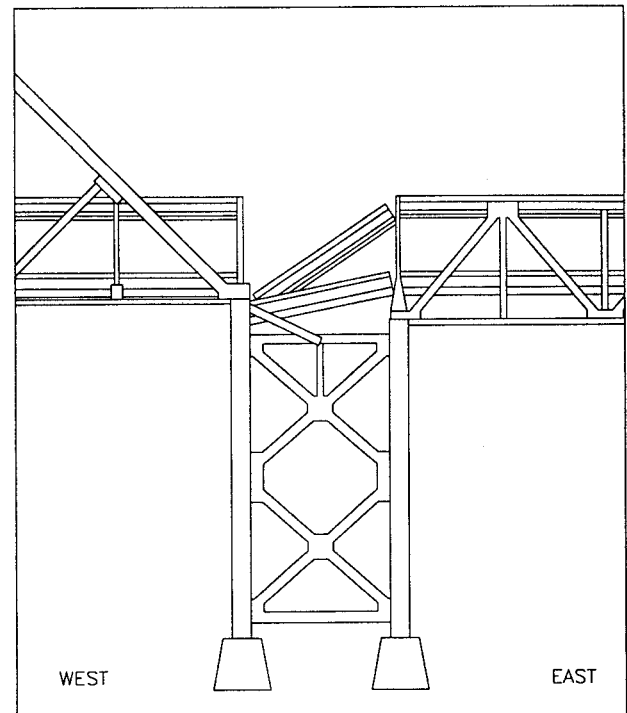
Schematic representation of pier E-9 (Bay Bridge).
